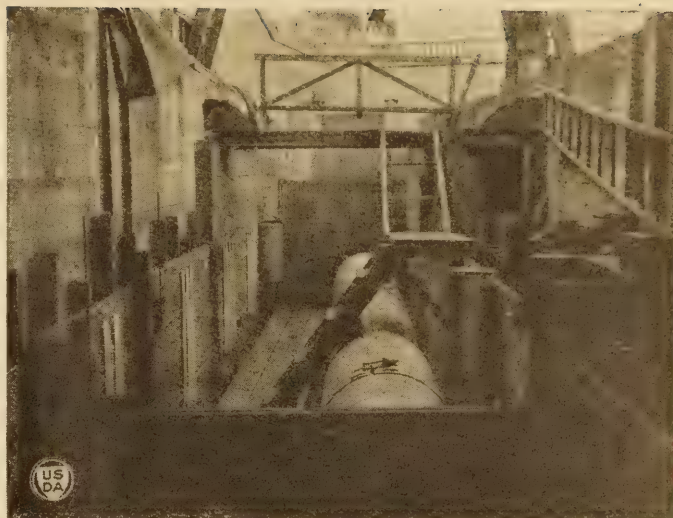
30-inch corrugated metal pipe in place for testing.
